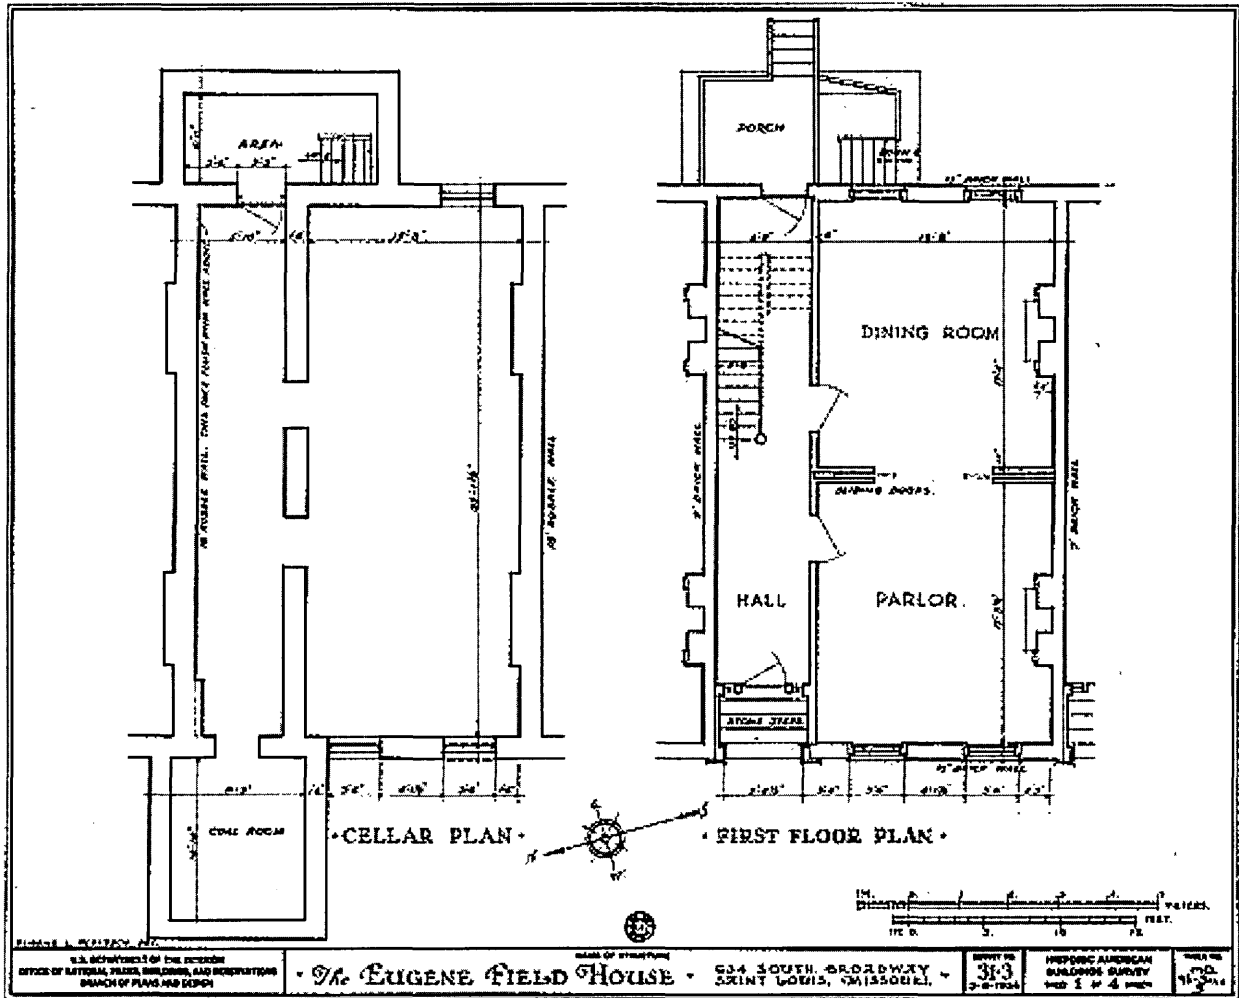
Eugene Field House Floor Plans – Cellar and First Floor
